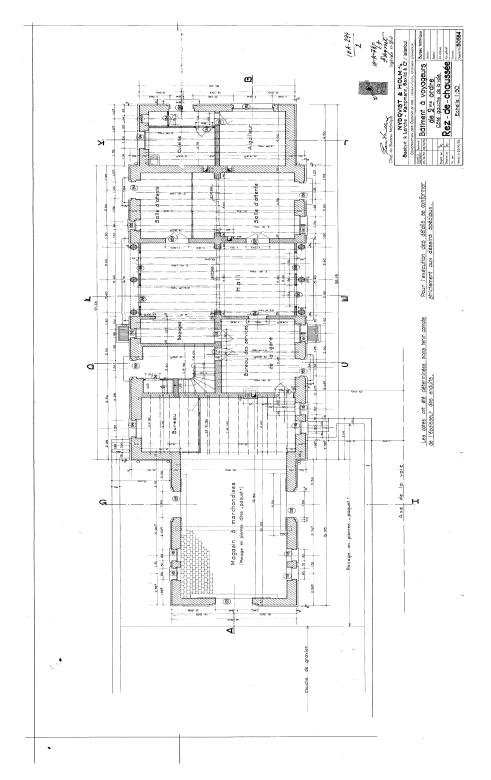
NYDQVIST-HOLM Company IInd Class project / Ground floor plan
